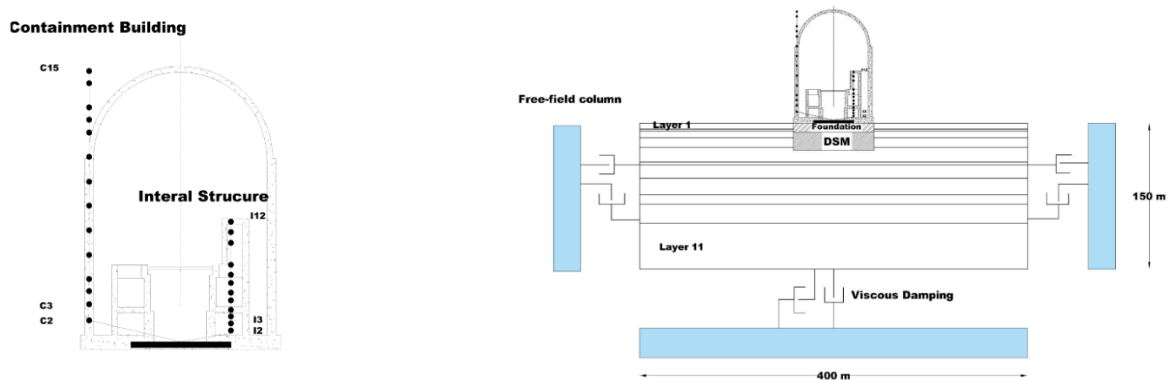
Soil structure system. (a) Stick beam; (b) Elevation view.
